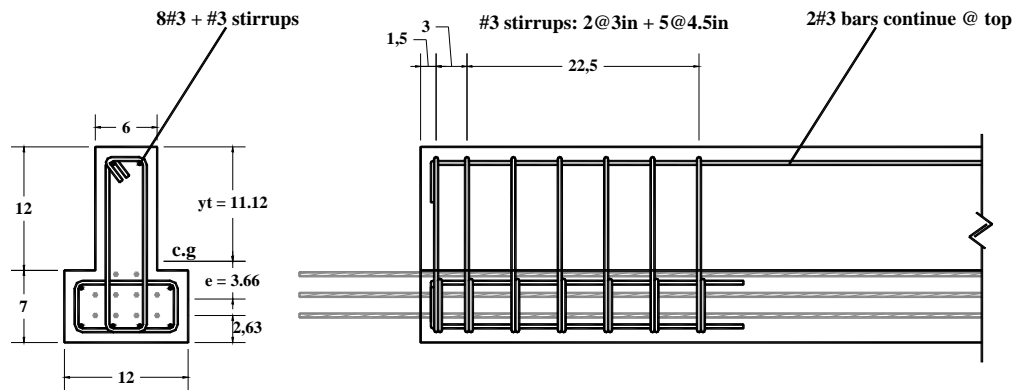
Inverted tee beams with top nonprestressed reinforcement
